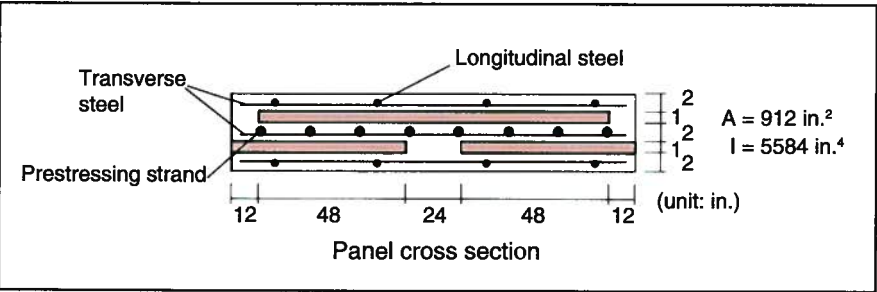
Design of 2-1-2-1-2 precast concrete sandwich wall panel. Note: 1 in. = 25.4 mm.
